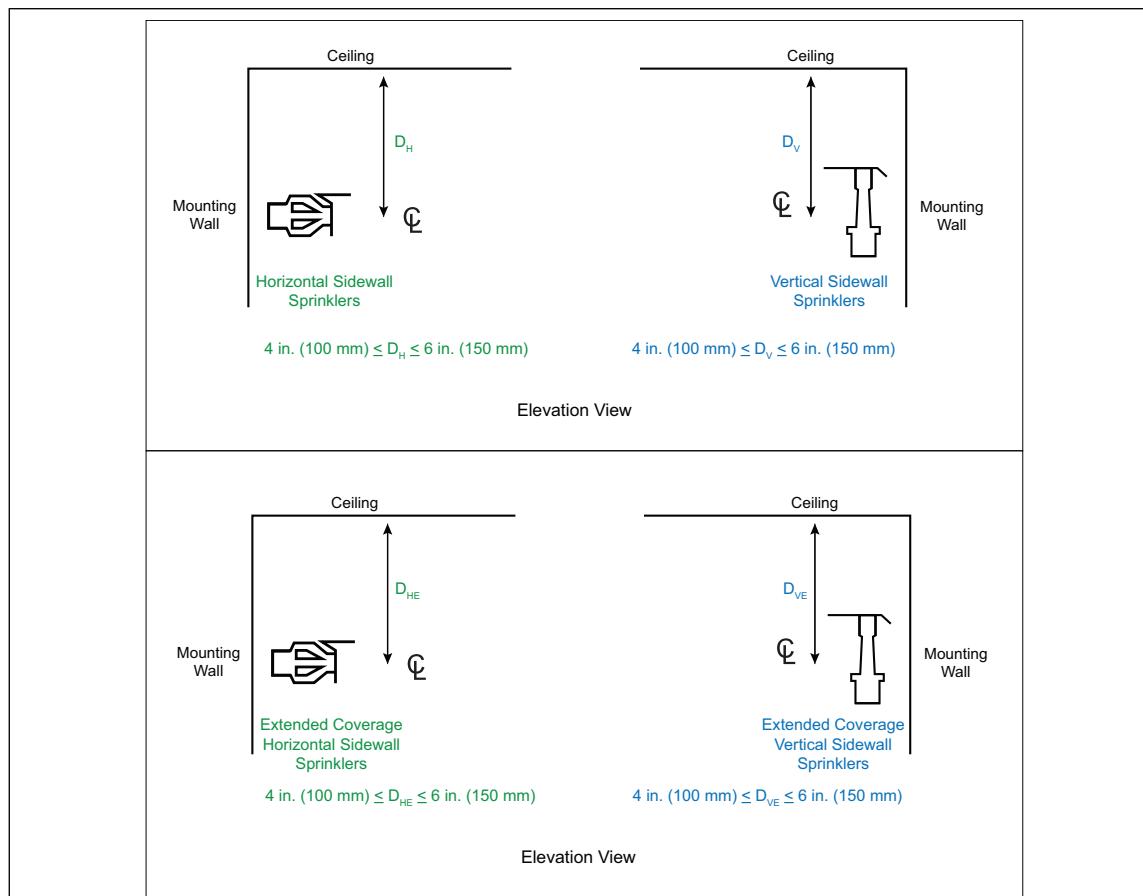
Vertical location of Nonstorage sidewall sprinklers
